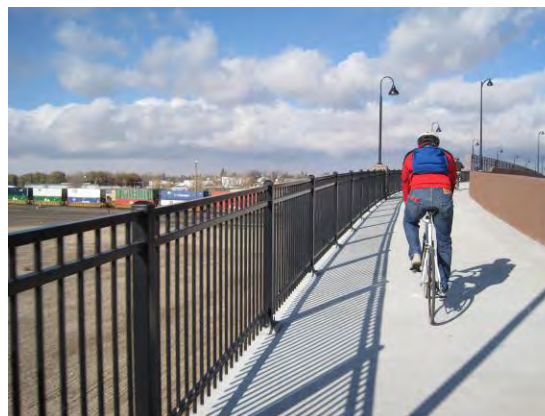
Barriers, such as the Union Pacific Railroad tracks, can be overcome by constructing facilities like the Greenway extension on the Norris Viaduct.
